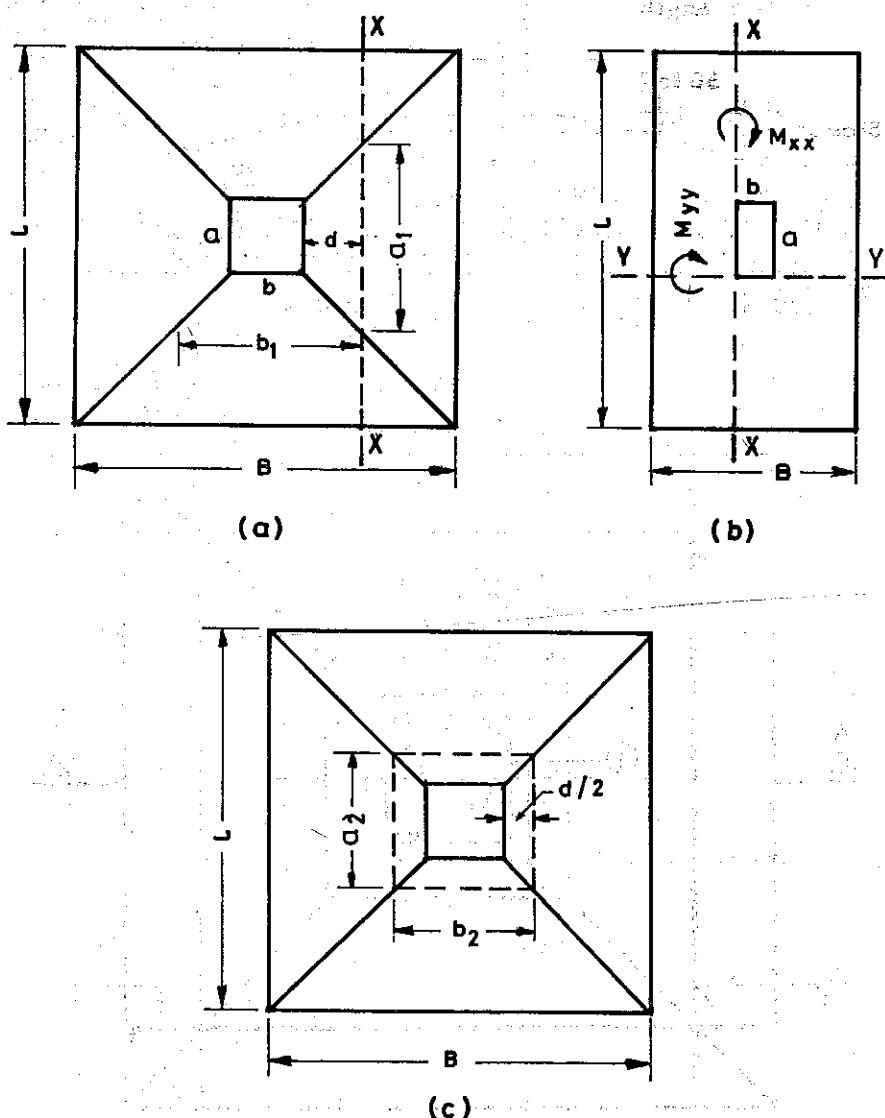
Design of footings: (a) Design of sloped footing, (b) Design of rectangular footing, (c) Checking of two-way shear in footings.
